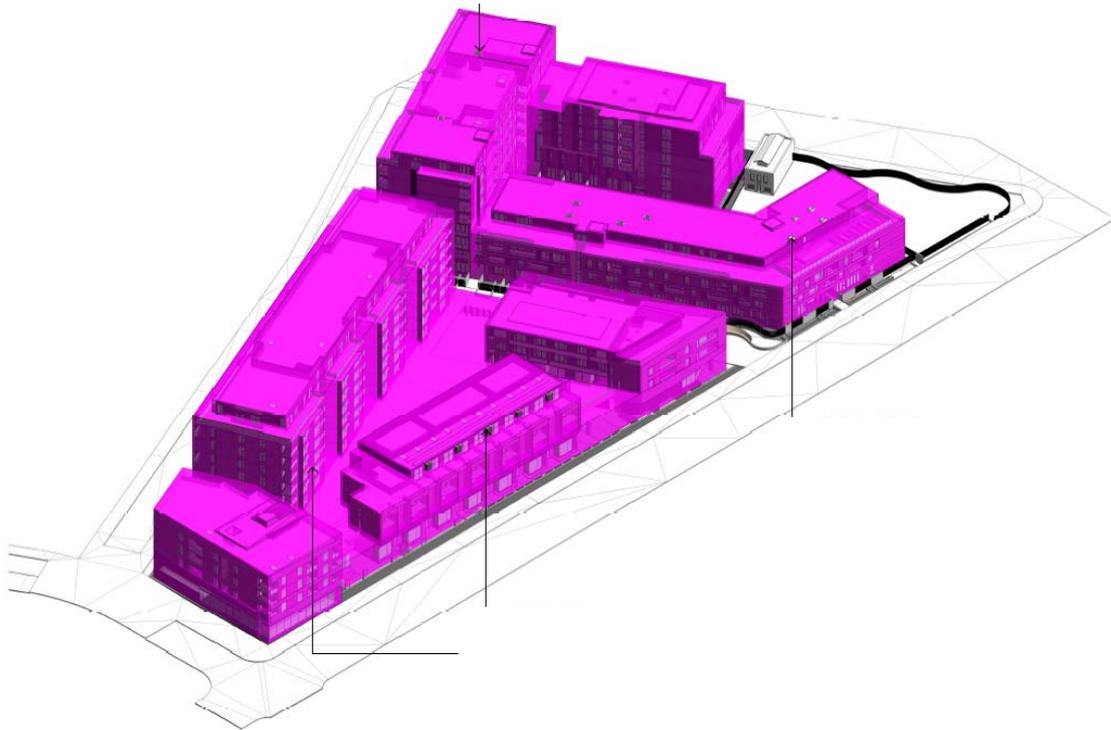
Axonometric drawing of the detailed design proposed for Blocks B and C within the Concept Approval building envelope, as viewed from an elevated position to the south-east
